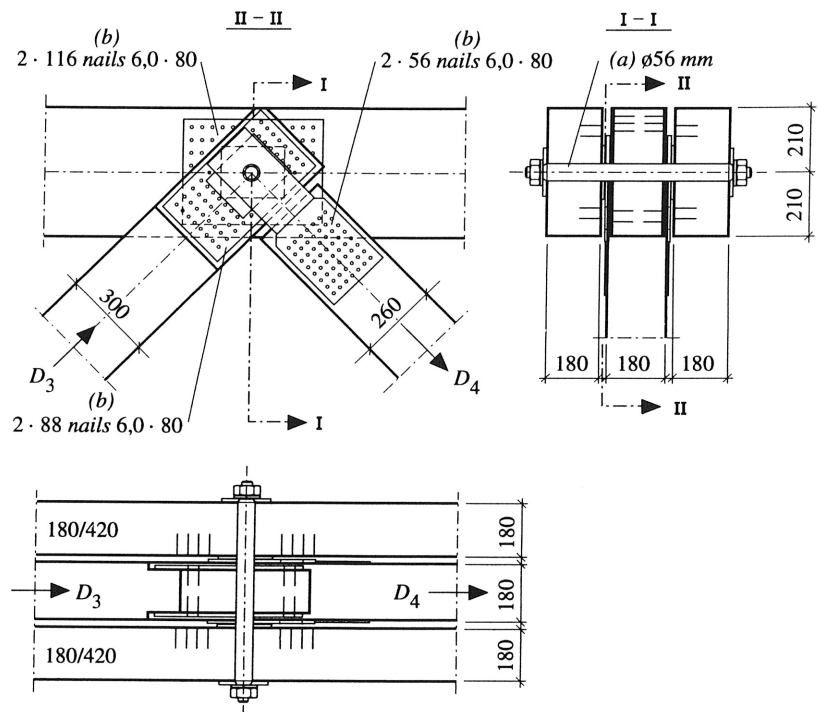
Upper chord node with nailed-on steel plates and central bolt.
